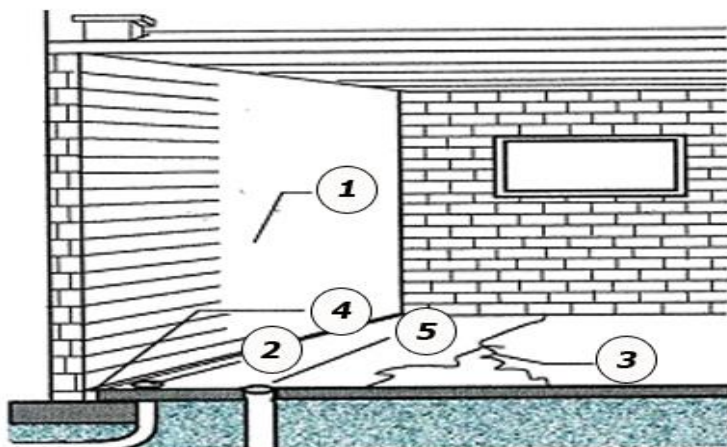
Scheme of ways of radon penetration into the premises: 1–block walls; 2–sewer pipe; 3–cracks in the floor; 4 – the place where the walls meet the floor; 5 - sewage well
